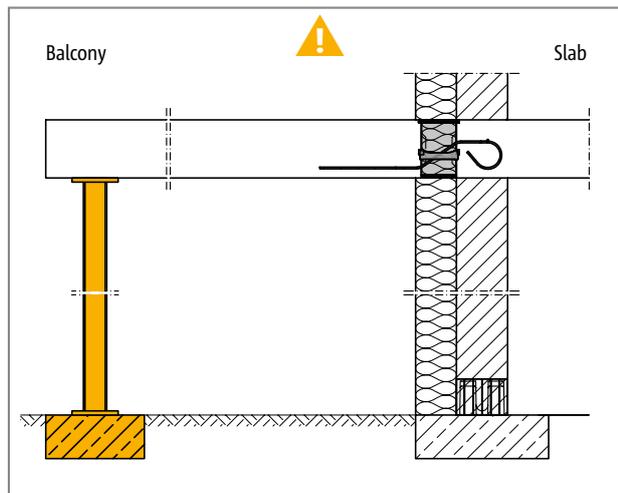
Schöck Isokorb® XT type Q: Continuous support required
